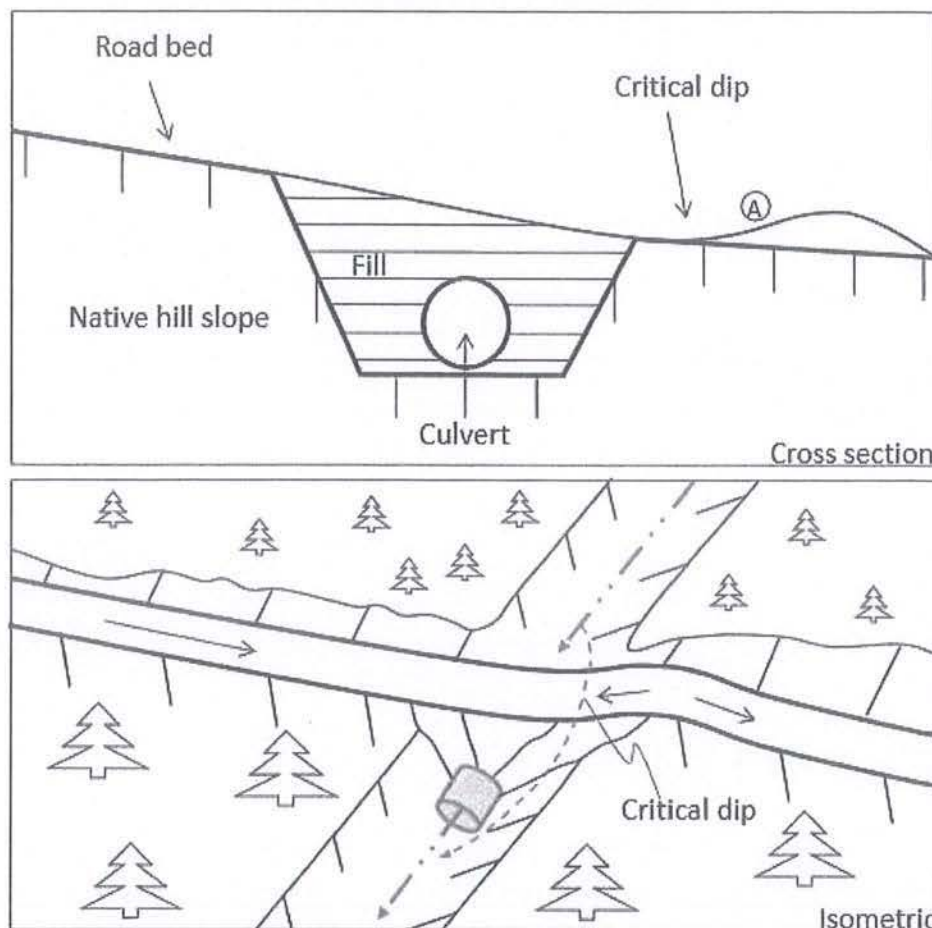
Critical dips or dipped crossing fills should be centered near a stream crossing's down-road hinge line, not over the centerline of the crossing where overtopping could cause washout or severe erosion of the fill. If the stream crossing culvert (B) plugs, water will pond behind the fill until reaching the critical dip or low point in the crossing (C) and flowing back down into the natural stream channel. The down-road ditch must be plugged to prevent streamflow from diverting down the ditch line. For extra protection in this sketch, riprap armor has been placed at the critical dip outfall and extending downslope to the stream channel. This is only required or suggested on stream crossings where the culvert is highly likely to plug and the crossing fill overtopped. The dip at the hinge line is usually sufficient to limit erosional damage during an overtopping event. Road surface and ditch runoff is disconnected from the stream crossing by installing a rolling dip and ditch relief culvert just up-road from the crossing (A) (Keller and Sherar, 2003).
